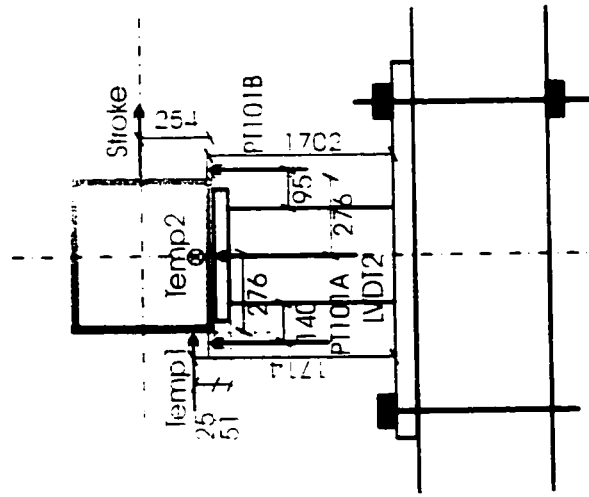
Location of the Sensors for Specimen V15T86M31 (All shown dimensions are in mm units)
